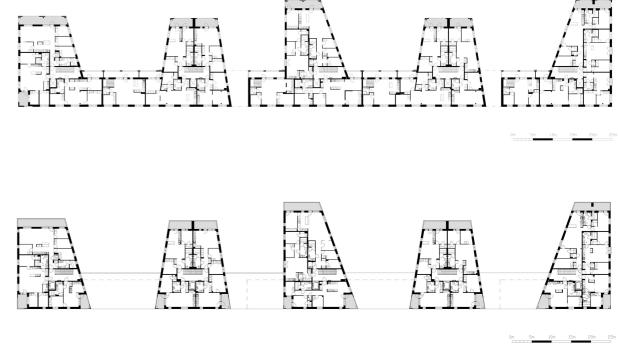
The spatial layout of Aleksis Kiven katu 19 allows for access to sunlight and
